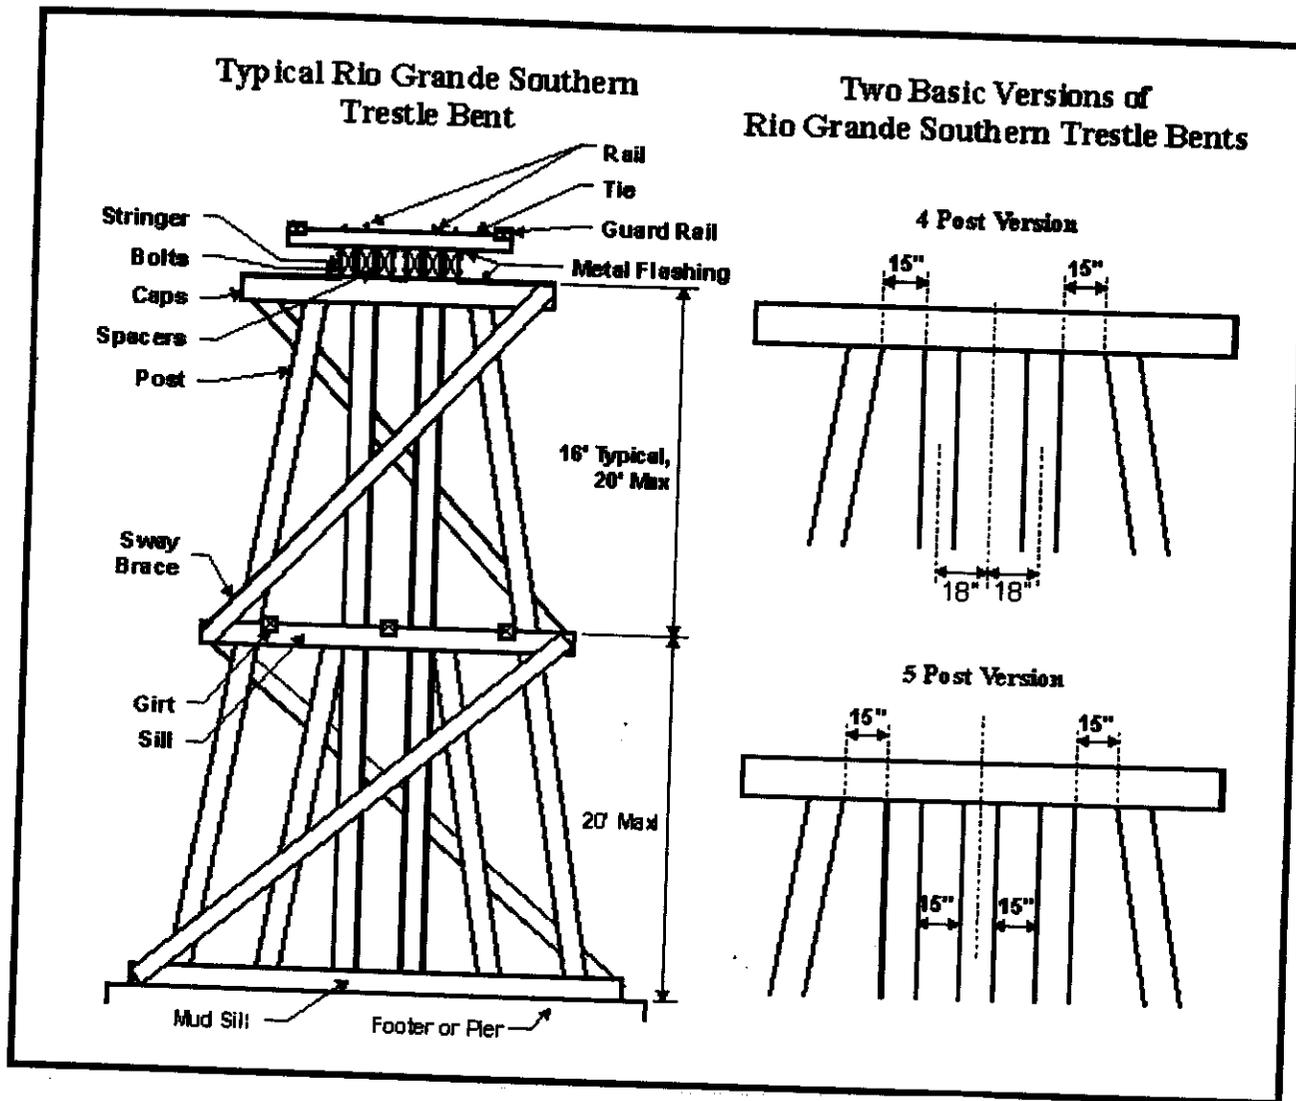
Drawing of typical trestle bent bridge with structural elements labeled. 1874 and 1888 bridge structures resemble these examples. (Illustration from "Typical Bridge Building Practices on the Rio Grande Southern Railroad," Volume I, September 1997.)
